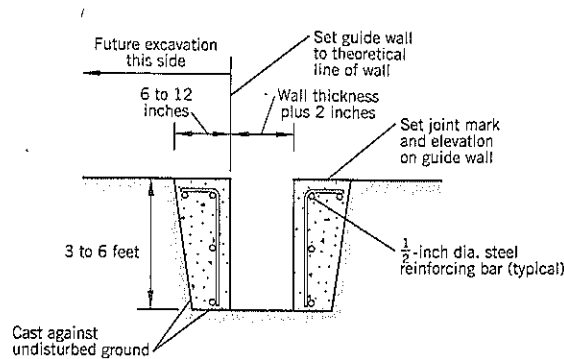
Typical guide wall details for a slurry trench wall (after Tamaro and Poietto).
